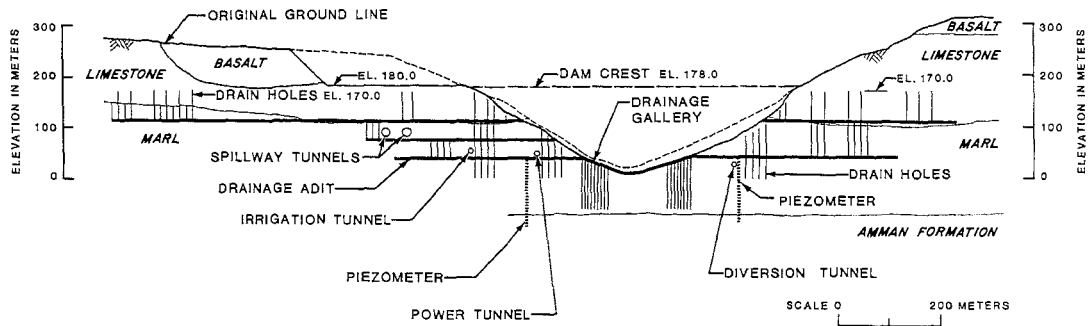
MAQARIN DAM, JORDAN—PROFILE OF DRAINAGE ADITS
